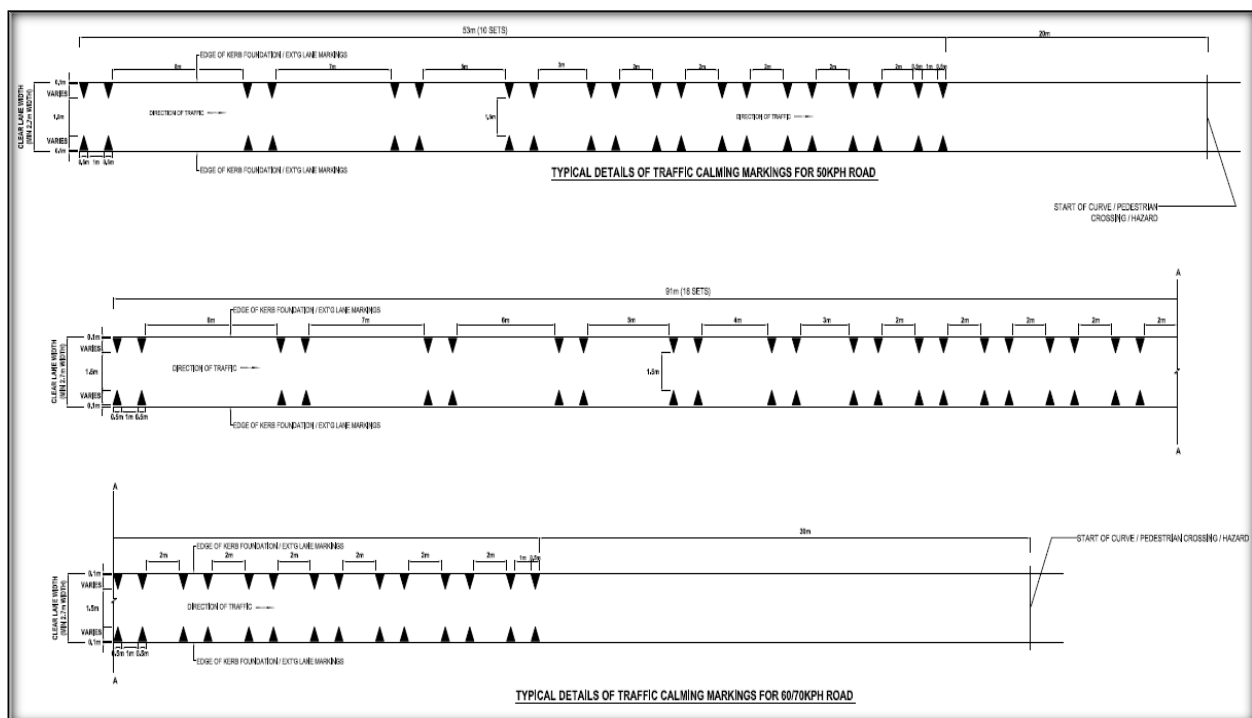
TrCM design layout (Source: LTA Standard Detail Road Elements, 2009)
